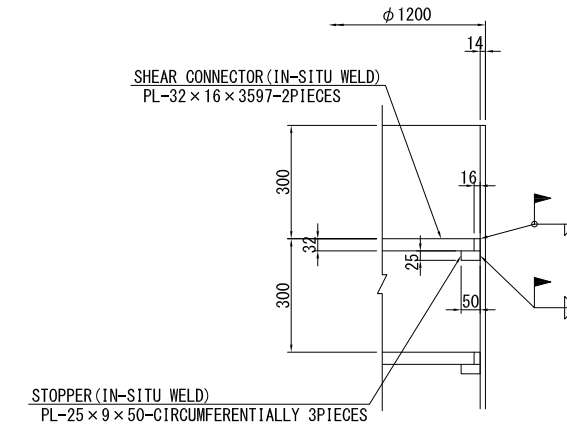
DETAIL OF ATTACHMENT OF SHEAR CONNECTOR
